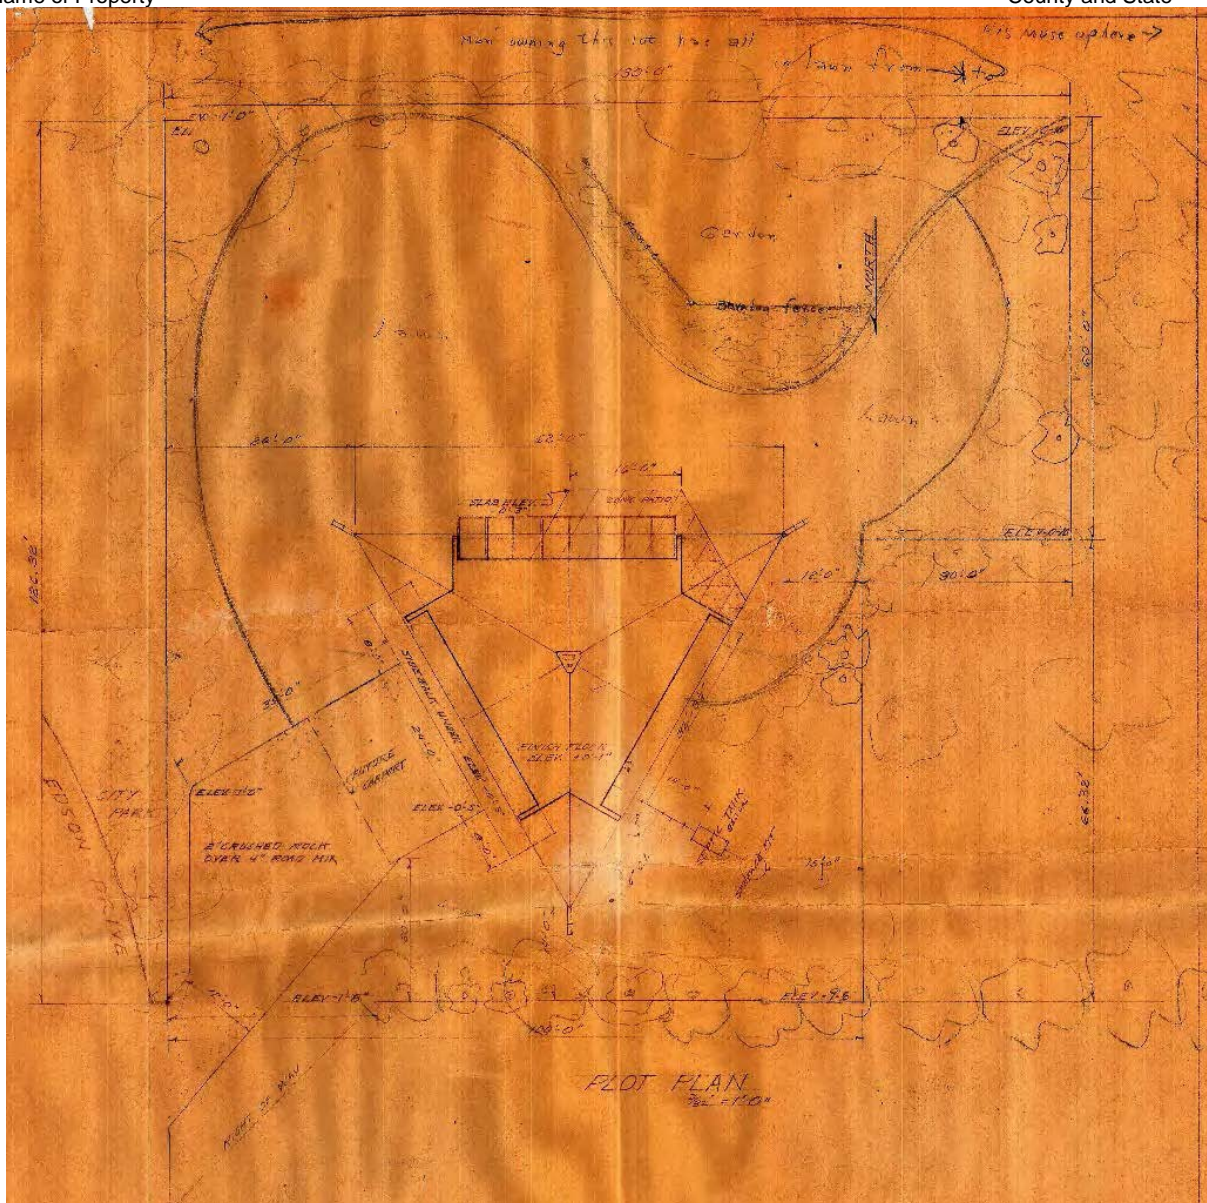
Original Plot Plan, depicting building footprint, landscaping, and location of future garage addition.¹³
